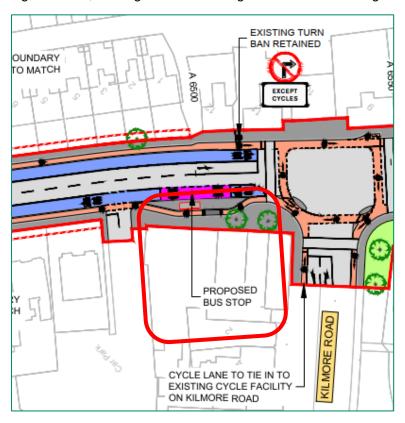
Proposed new Layout at the Goblet Bar and Lounge
